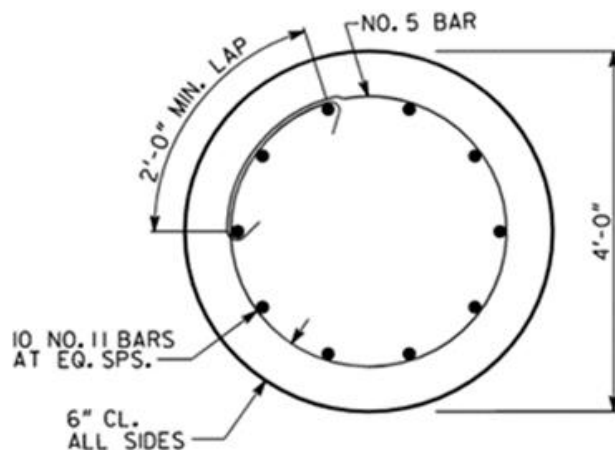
Engineering drawings. Dimensions and rebar layout of each specimen tested in the lab
